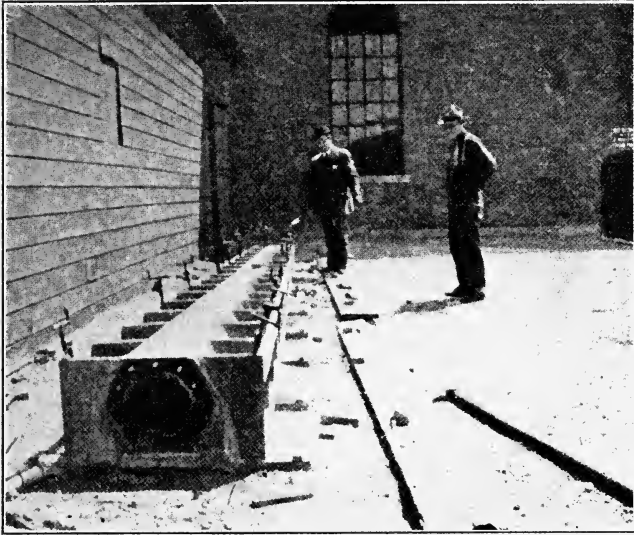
Forms used for Oklahoma Gas & Electric Co.'s hollow concrete poles.
